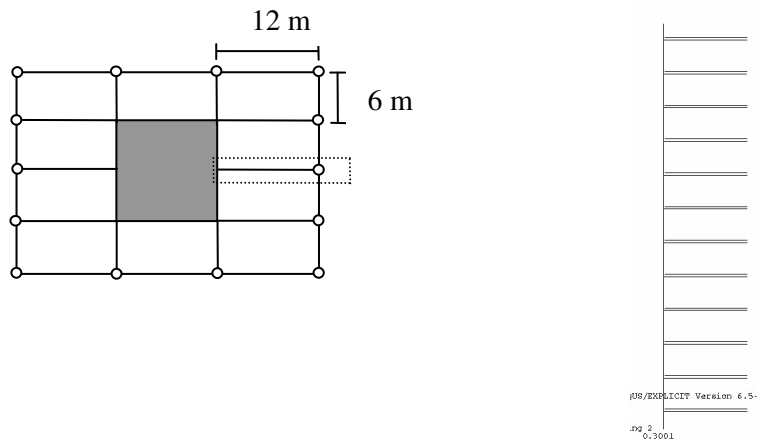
Typical plan of a multi-storey frame model and the Finite Element Model cross section adopted
